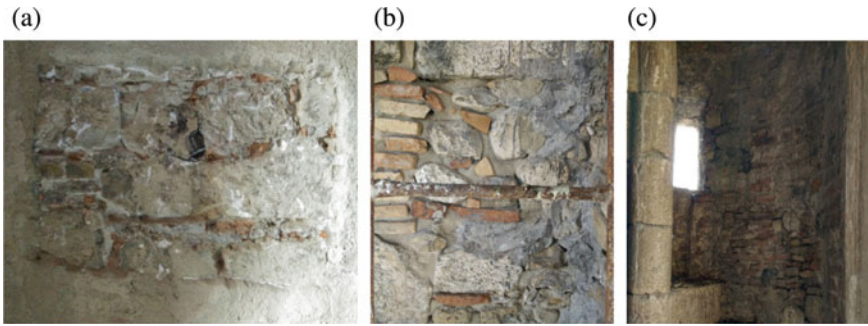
Internal texture of the main body walls (a), belfry walls (b) and circular wall at staircase (c)
